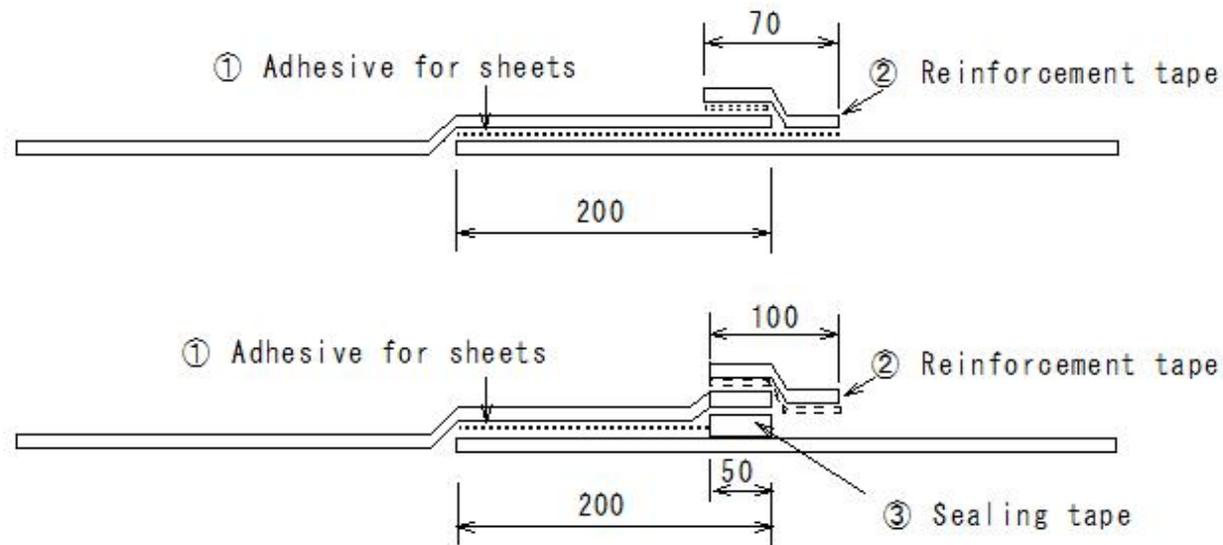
On-site joint construction (synthetic rubber sheets)
